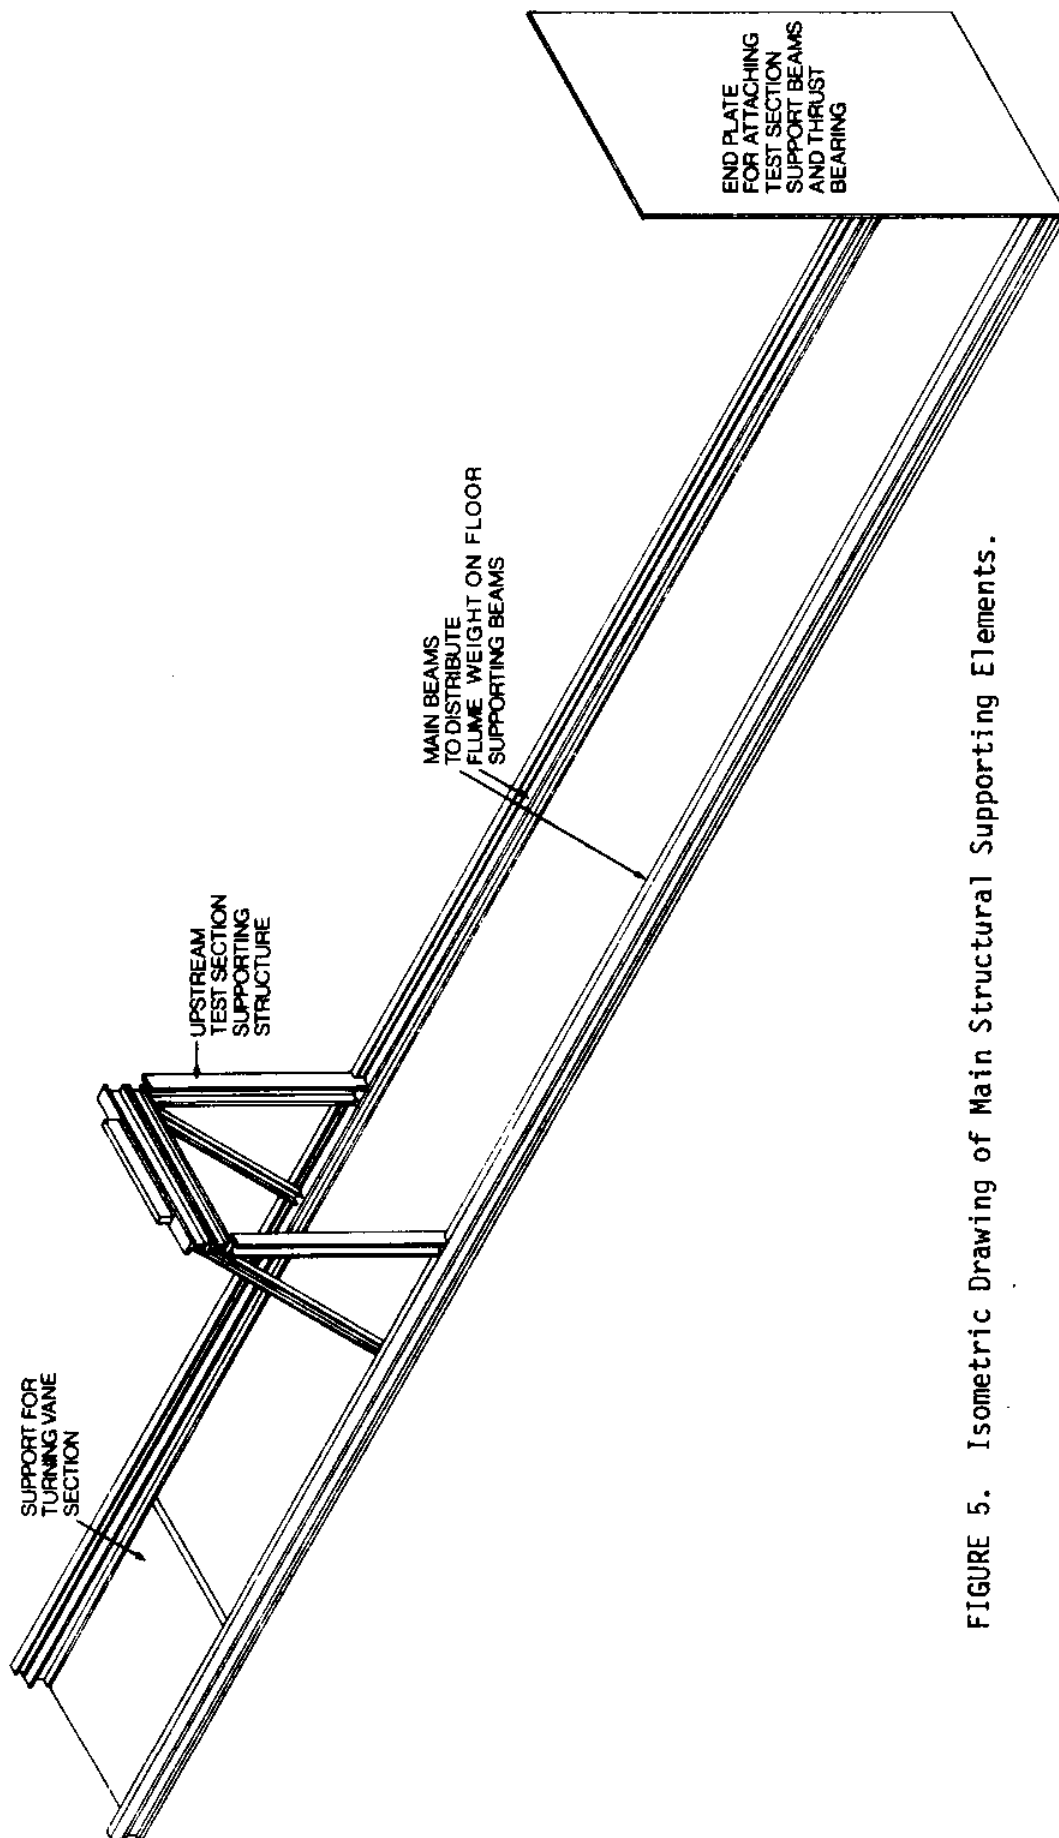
Isometric Drawing of Main Structural Supporting Elements.
